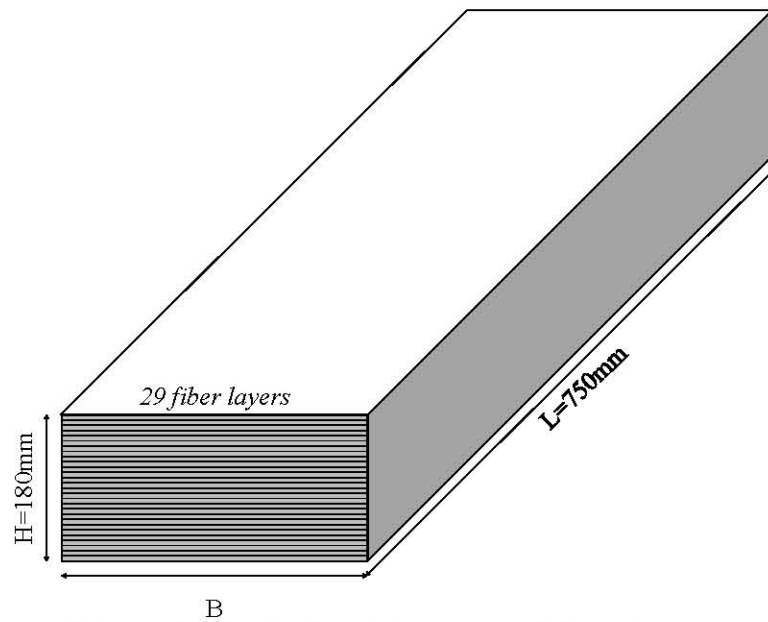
Strip type bearing showing reinforcements and dimensions.
